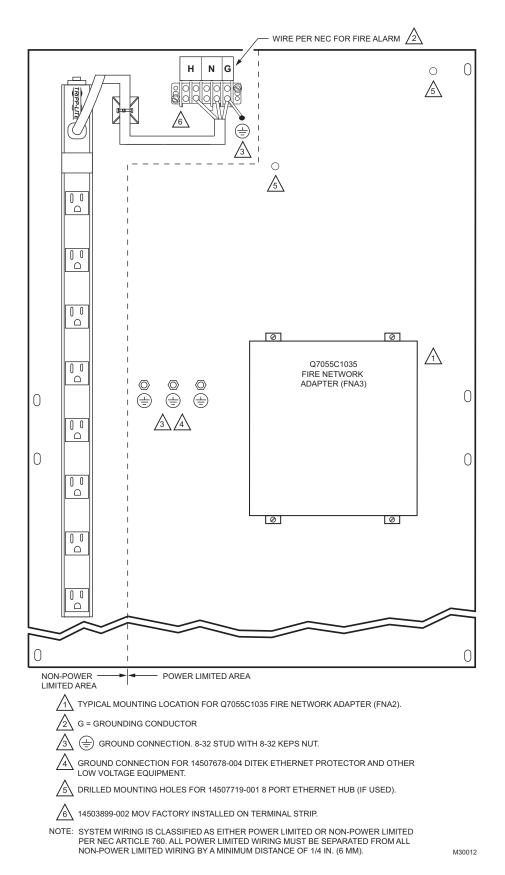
Typical Mounting of Q7055C1035 FNA3 on 14006090-555151 Communications Panel.
